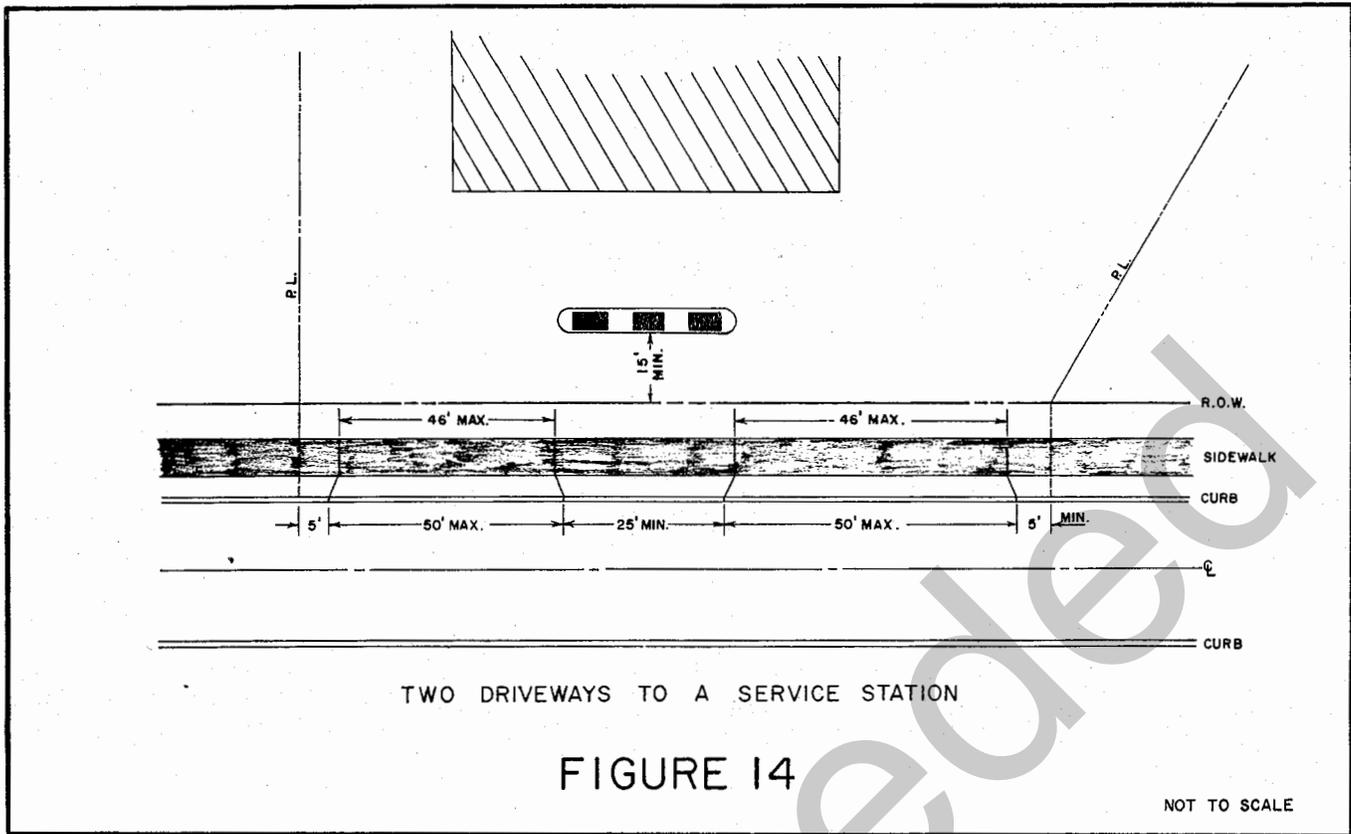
TWO DRIVEWAYS TO A SERVICE STATION: Figure 14 shows two driveways going into a service station or other roadside business. Usually urban conditions, such as curbed roadway, sidewalks, and limited frontage exist. For such cases, the driveway has no element of length along the highway; primarily it is a ramp pavement from curblines to business area or the right-of-way line. Often a sidewalk is crossed, affecting the profile condition. Functional utility of the driveway largely depends upon the width of opening at the curblines. Edge clearances are important since similar driveways may be necessary on adjacent properties. Curb depressions should not exceed fifty (50) feet in length.
